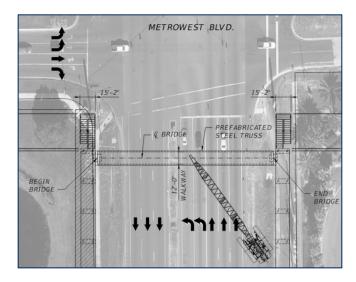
| Crane Position at the Kirkman Road at Metrowest Boulevard Intersection
